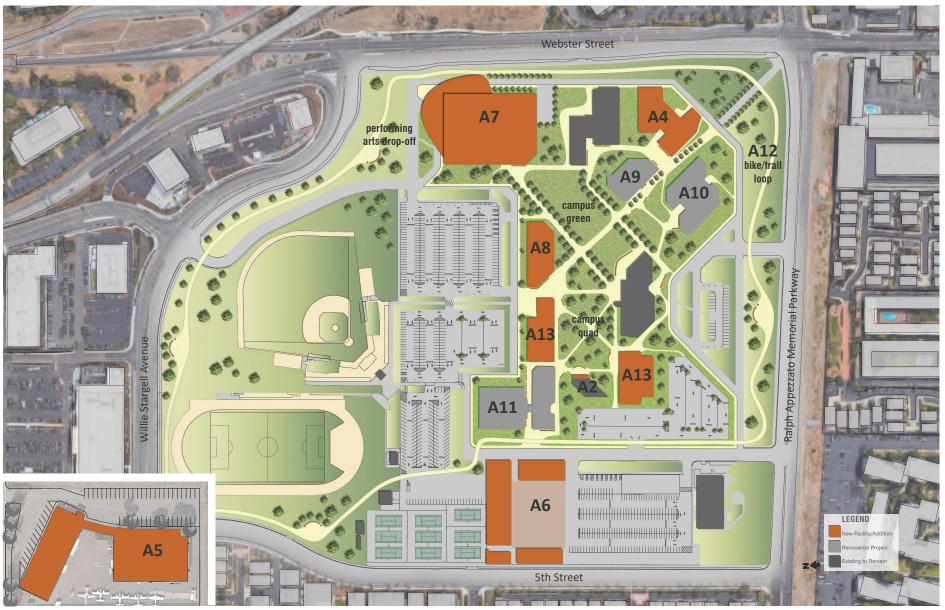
2017 Facilities Master Plan (No Labels)
